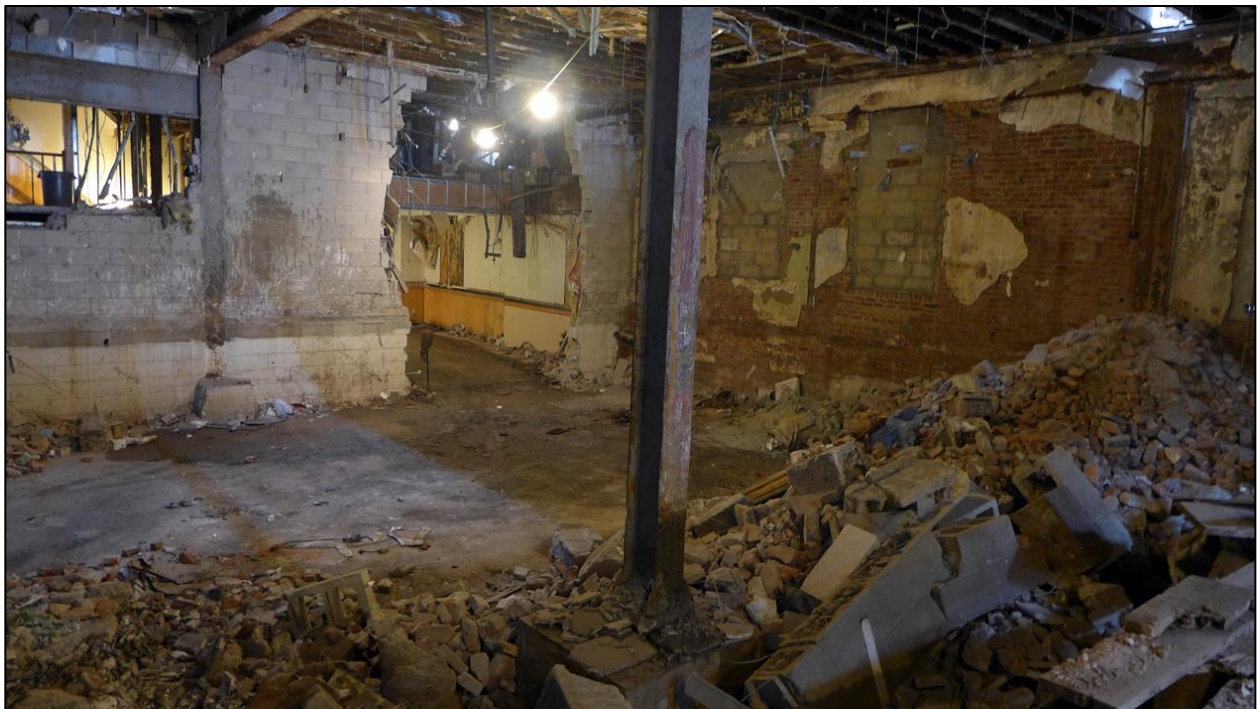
Street level interior of 50 Bowery looking northwest toward Elizabeth Street. Note change in elevation from Bowery Street and former window wells of 26 Elizabeth Street.
